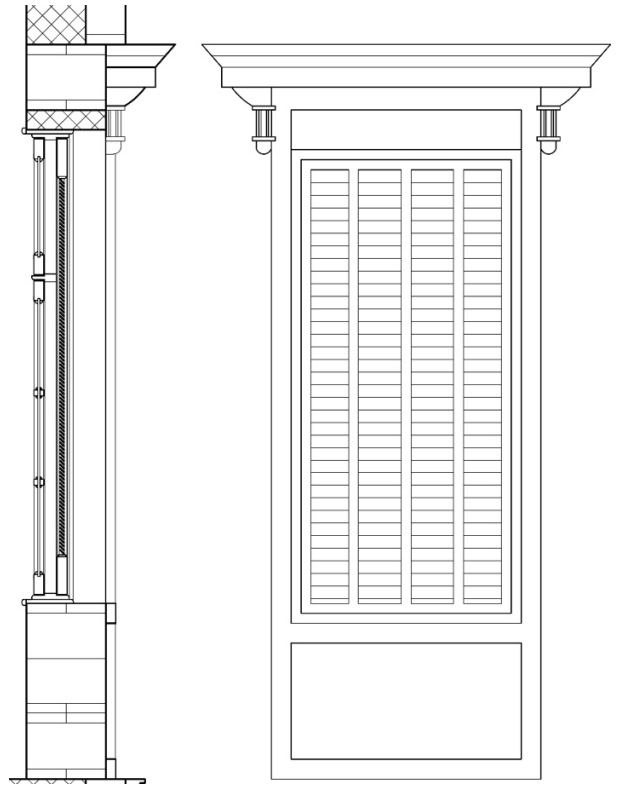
opening details with external wooden shutters surrounded by decorative gypsum Cornish, source: the researcher
